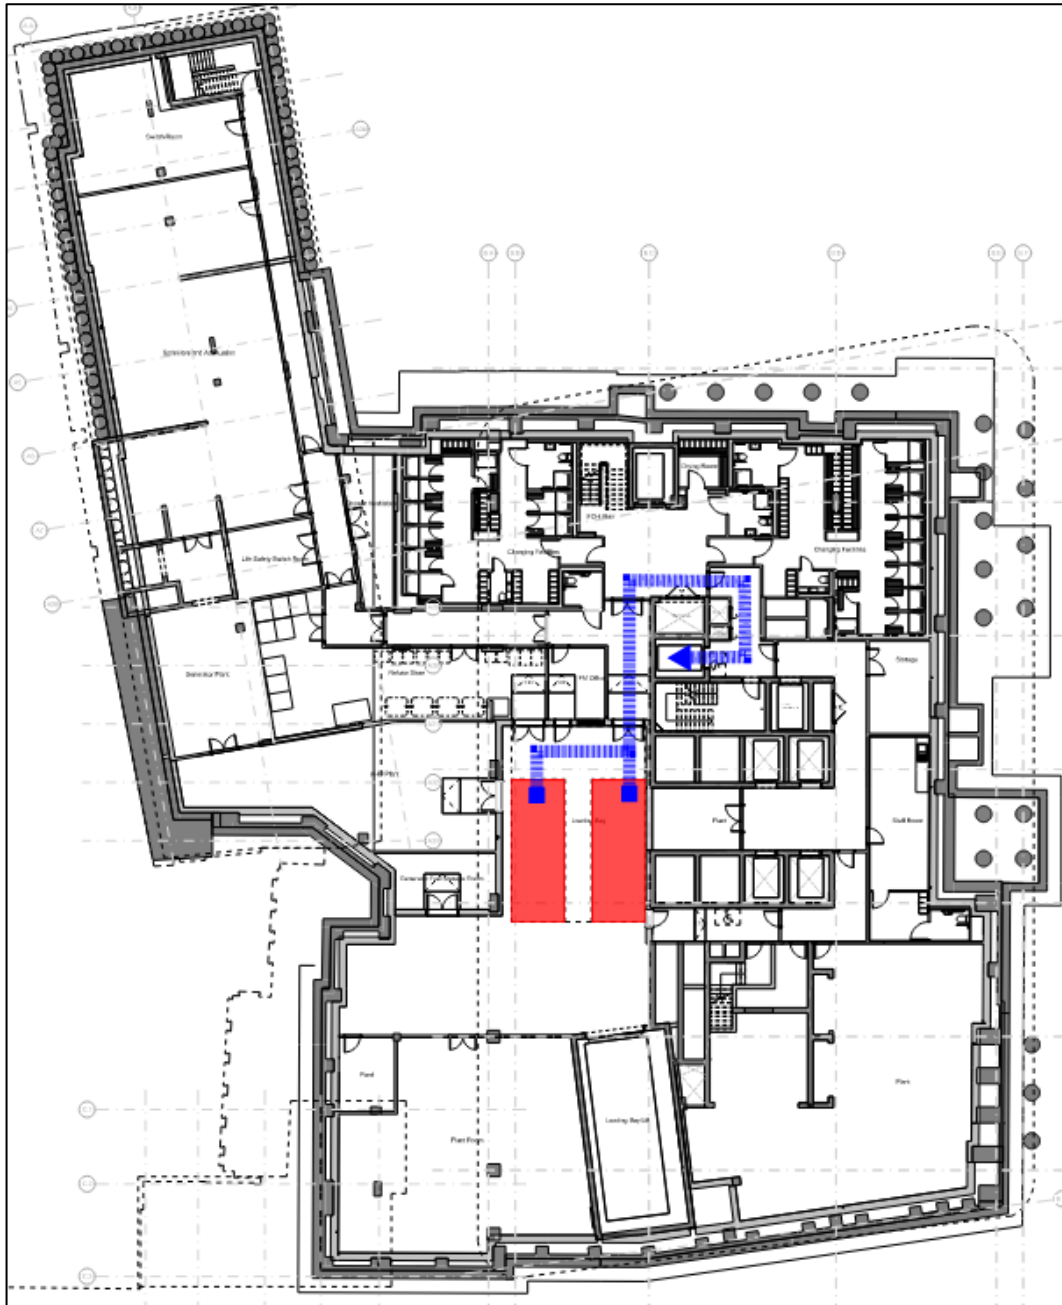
1 Museum, Street and Vine Street ground floor goods distribution routes
